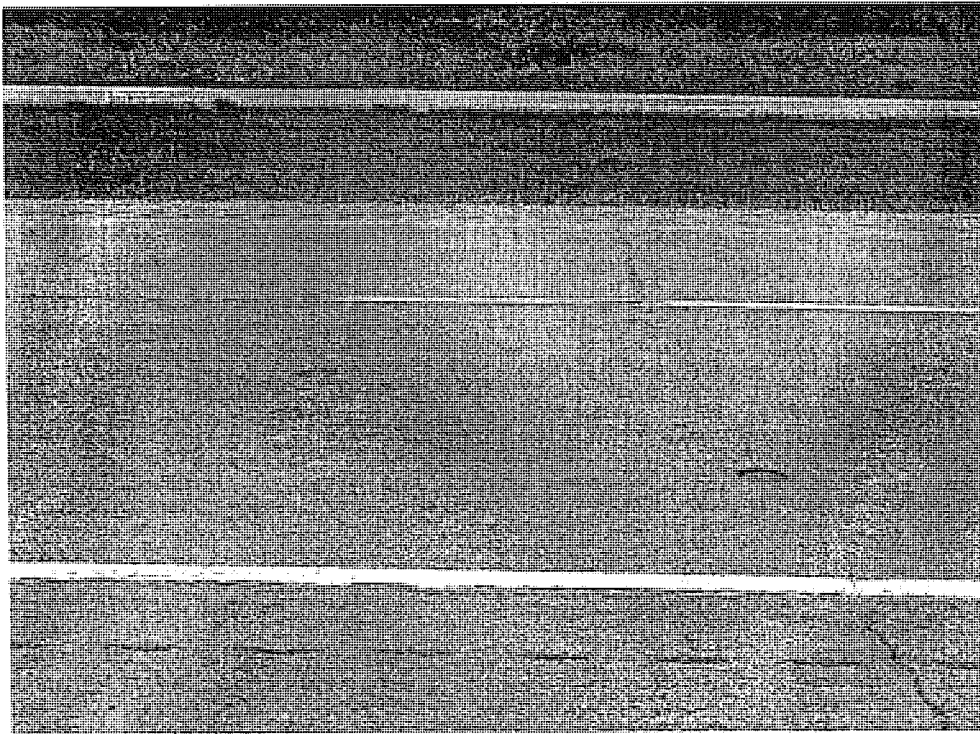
Transverse crack across lanes on I-194 NB section 1 test site 2
